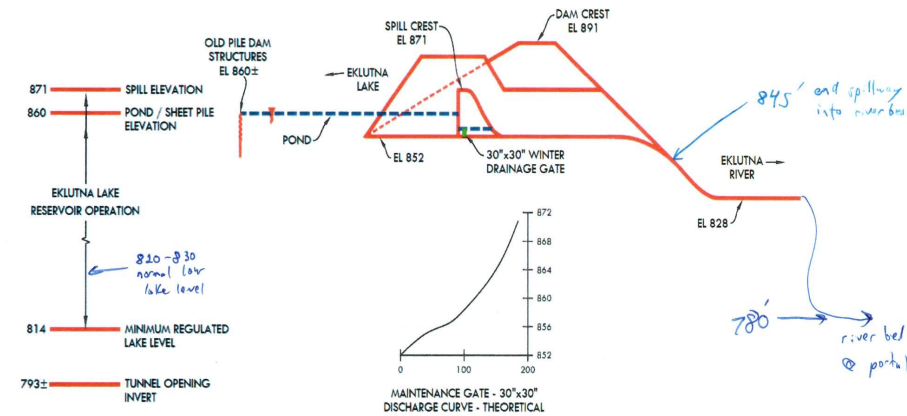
Profile of Project Dam and Spillway, Critical Elevations, and Drainage Gate Discharge Curve
